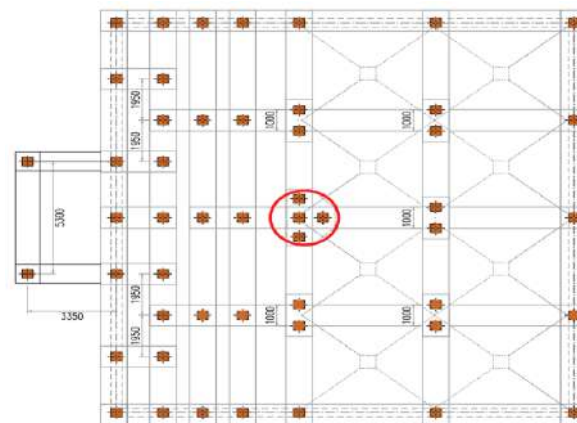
Foundation Plan and Foundation Points Receiving the Greatest Load
